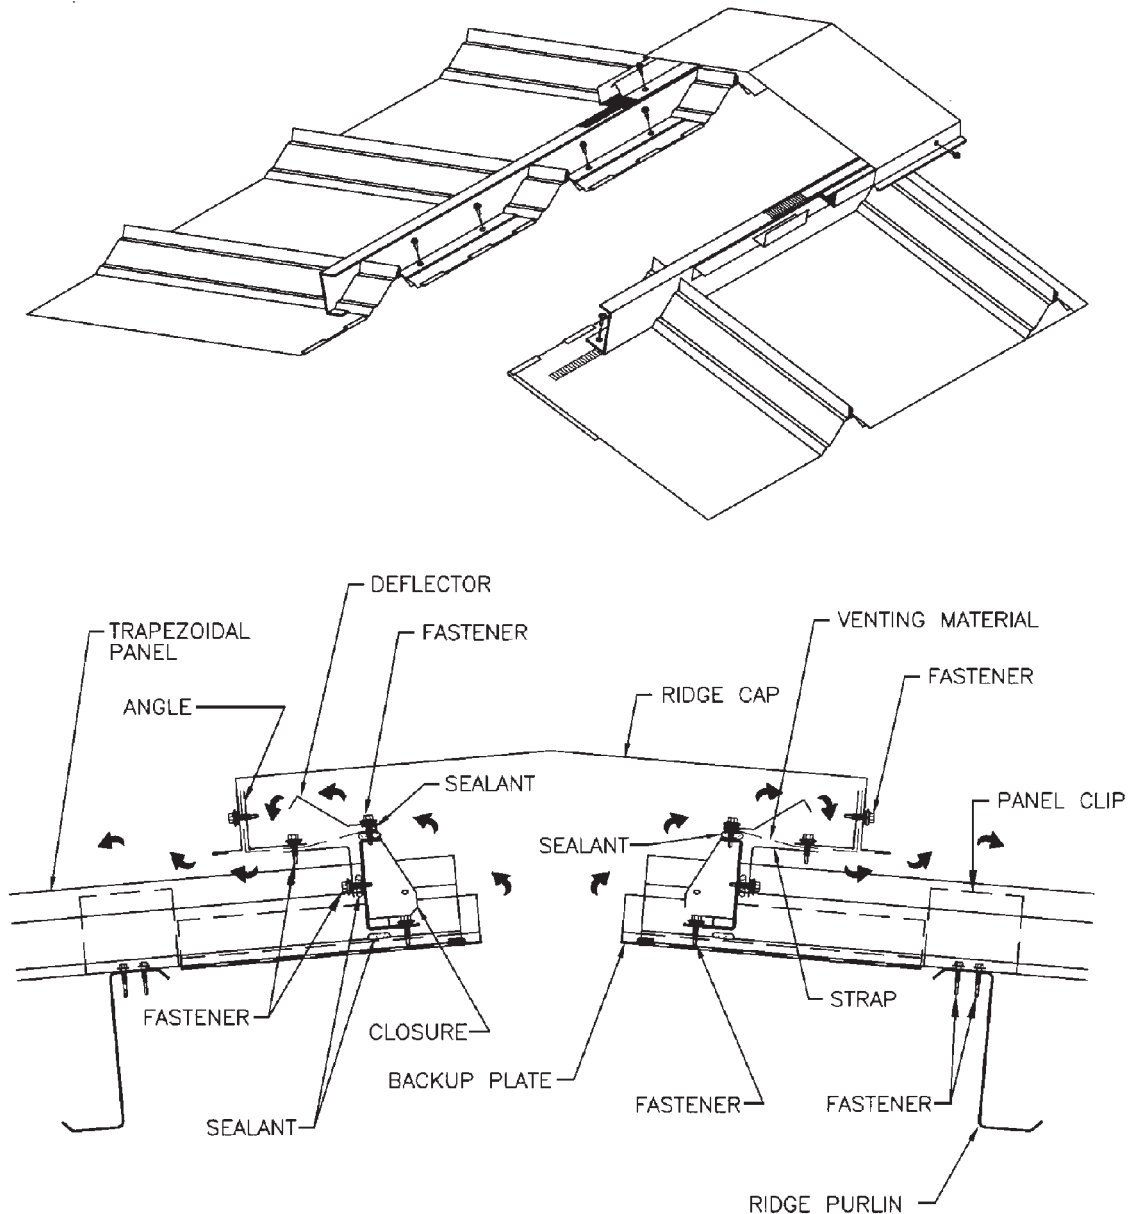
Details of standing-seam roofing with trapezoidal profile at floating ventilated ridge. (MBMA.)
